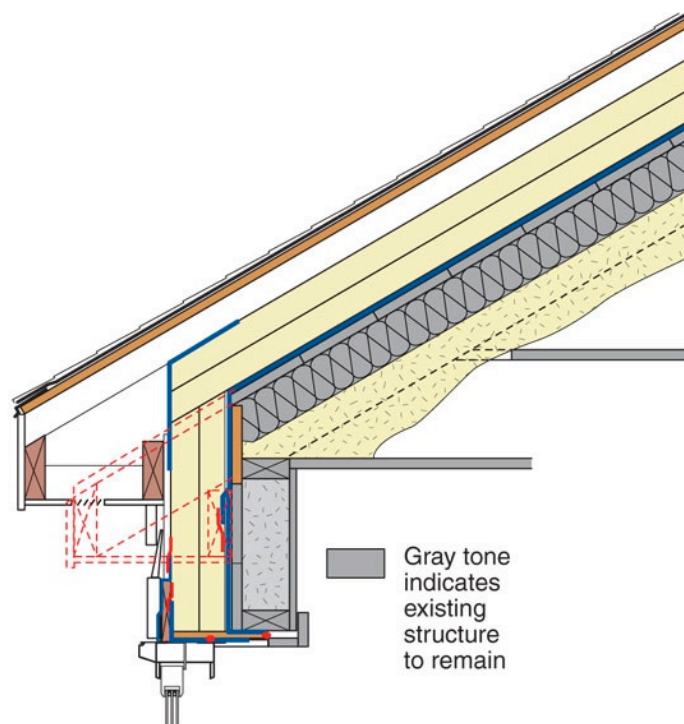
Roof-wall interface in a chain saw retrofit configuration. Note how the airflow control and thermal control layers are uninterrupted over the roof-to-wall transition. Location of the original overhang prior to removal is indicated by the dashed red outline.
